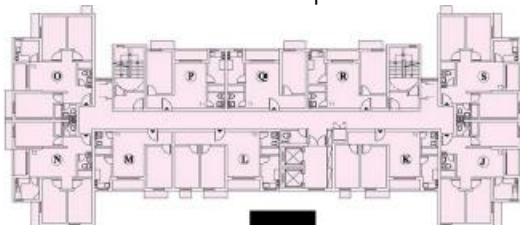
Floor Plan, Floor 2-23, Block 2, EDF. de Alameda da Tranquilidade
